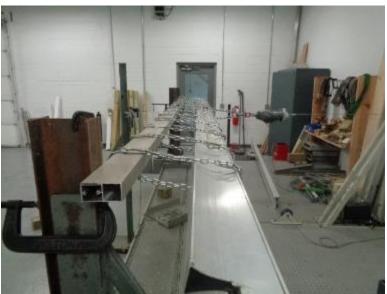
2 in by 4 in Batten, Single Span, Load Away from Support - Test Setup
